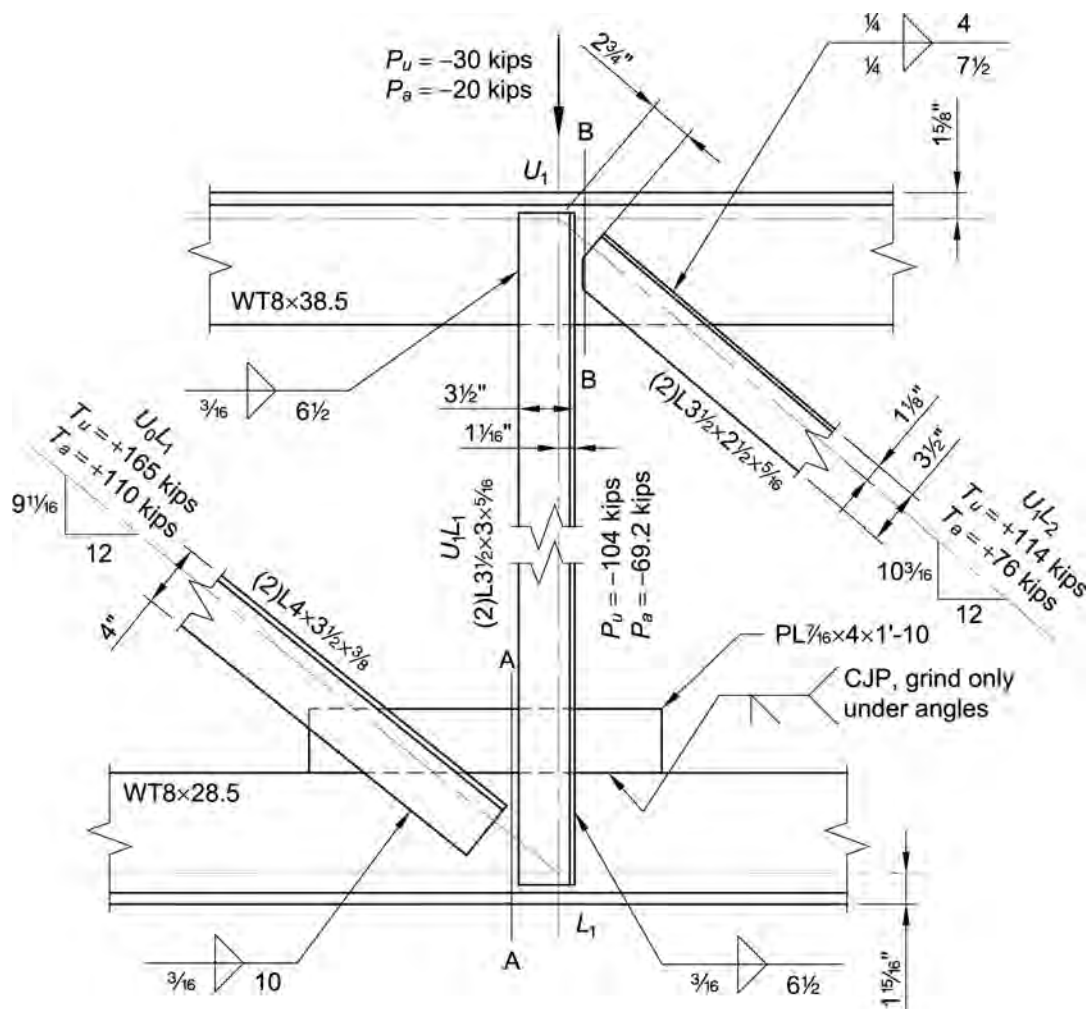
Connection geometry for Example II.C-2.
